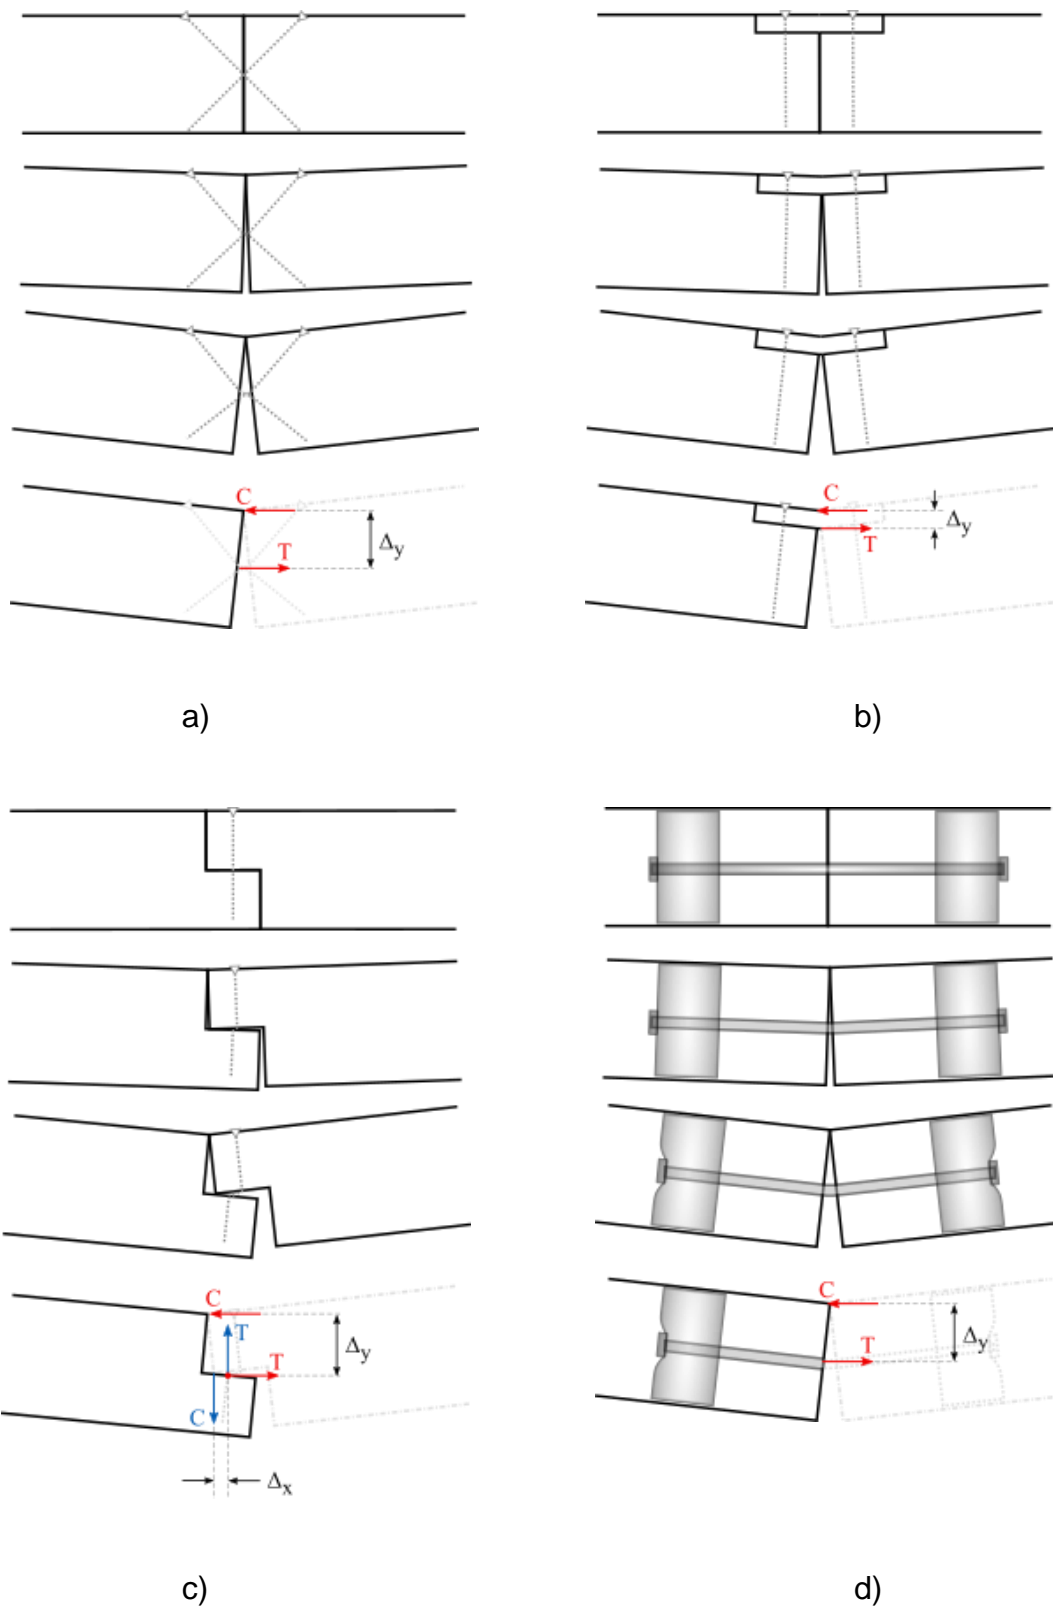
12 The moment couples forming in the timber connections a) butt joint, b) single surface spline joint, c) half-lap joint b) tube connector.
